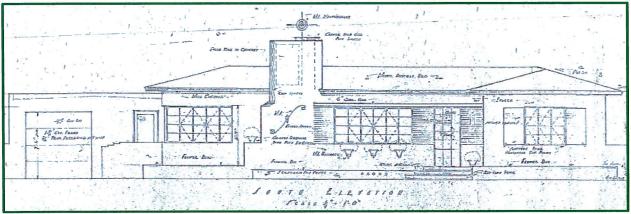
Front (South) Elevation, Permit #5338 Drawings, 1938, Robert Fitch Smith, Architect
